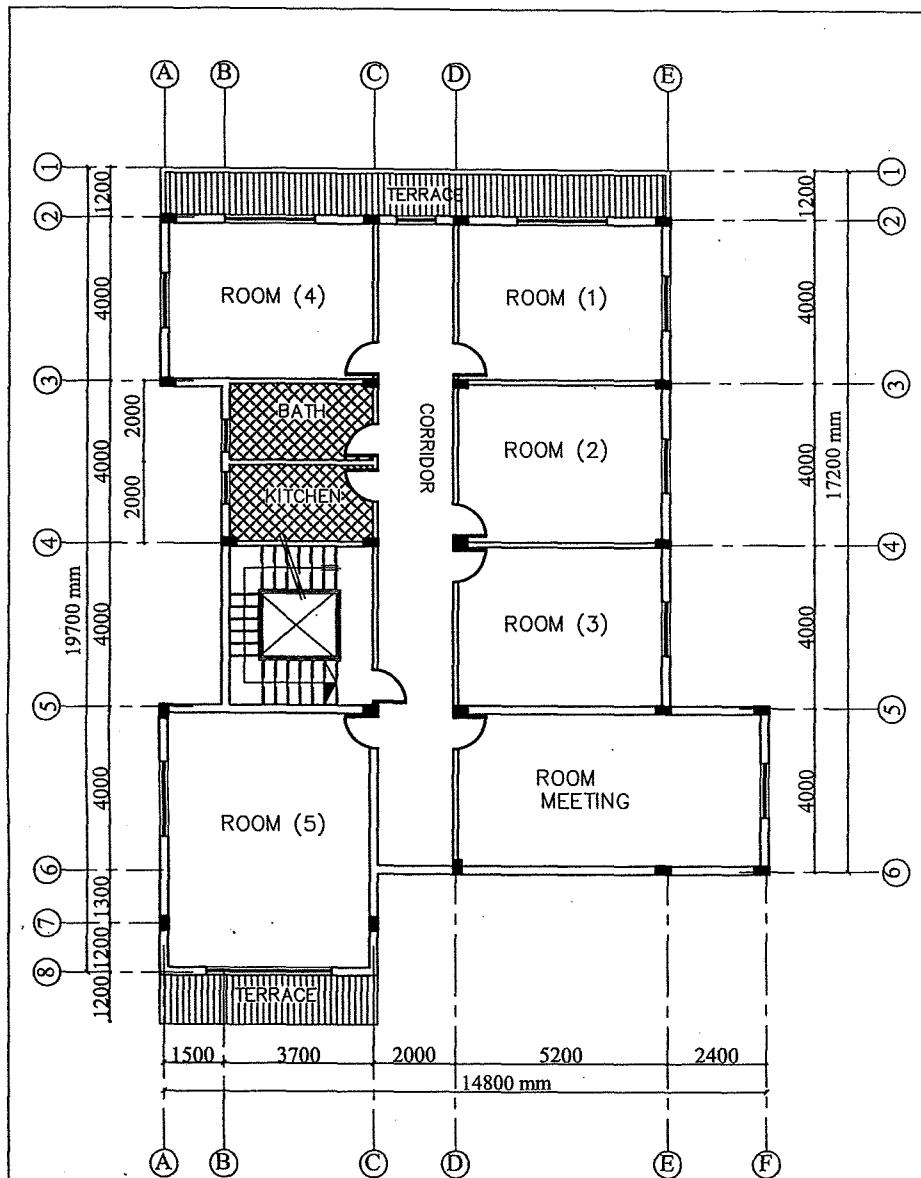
Architectural plan for a typical floor of an office building
